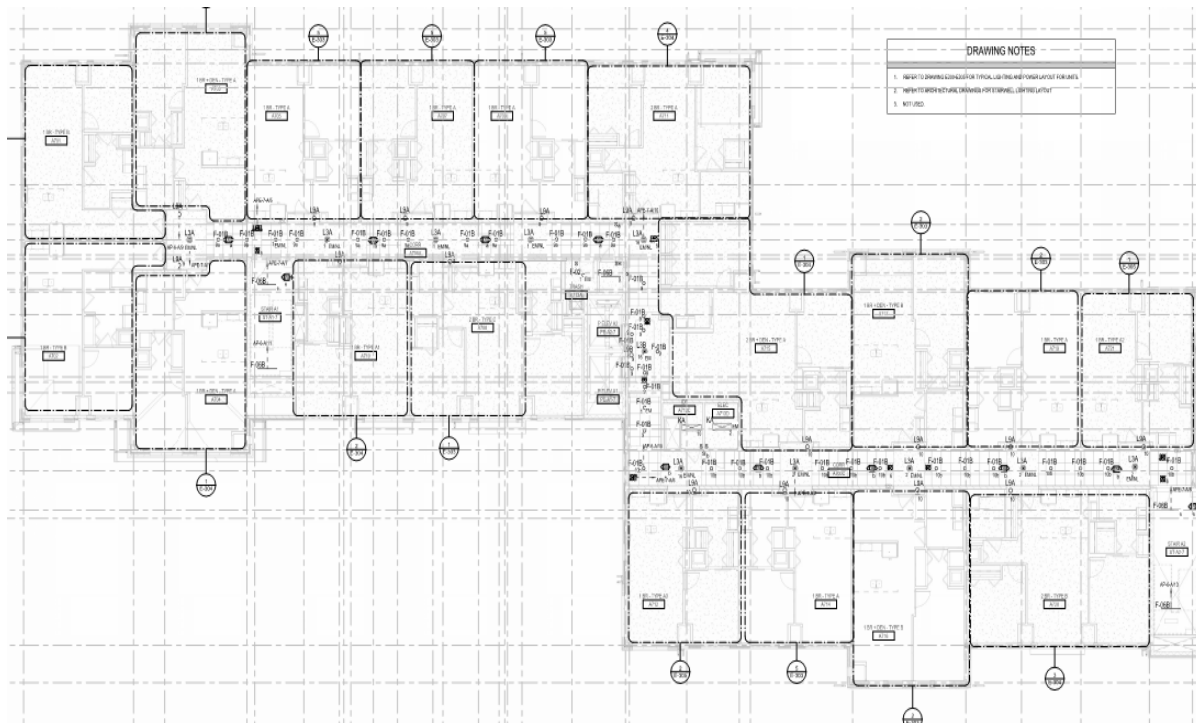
Drawing E-207A, Floor 7 lighting fixture layout, square footage same as level 2.
